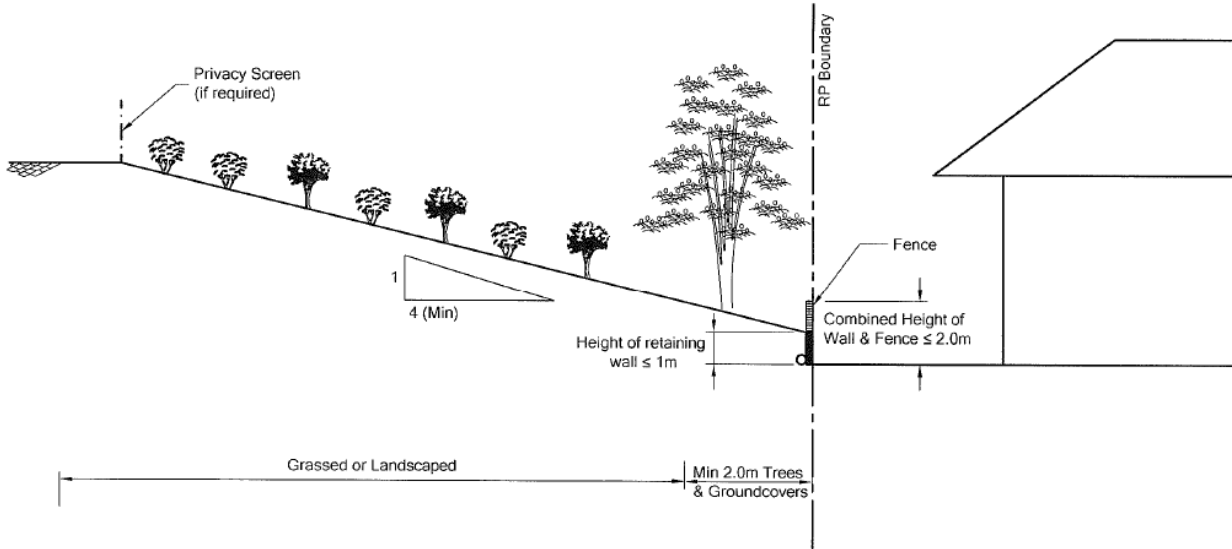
Fill embankment: landscaped batter with low retaining wall
